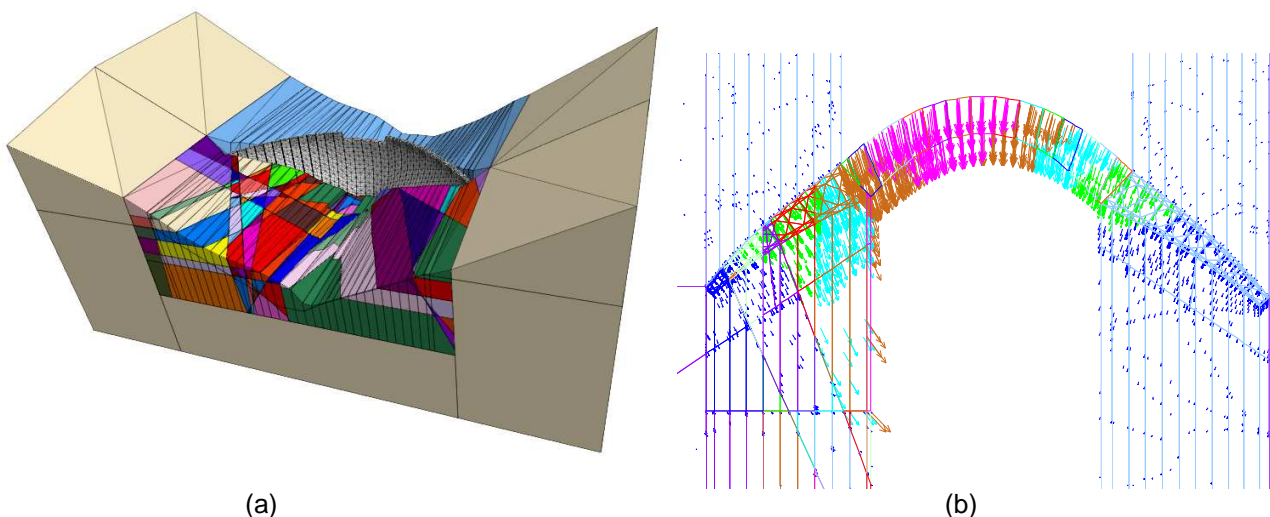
(a) Discrete element model of dam and rock mass; (b) Displacements on horizontal cross section denoting failure mode on the right bank abutment.
